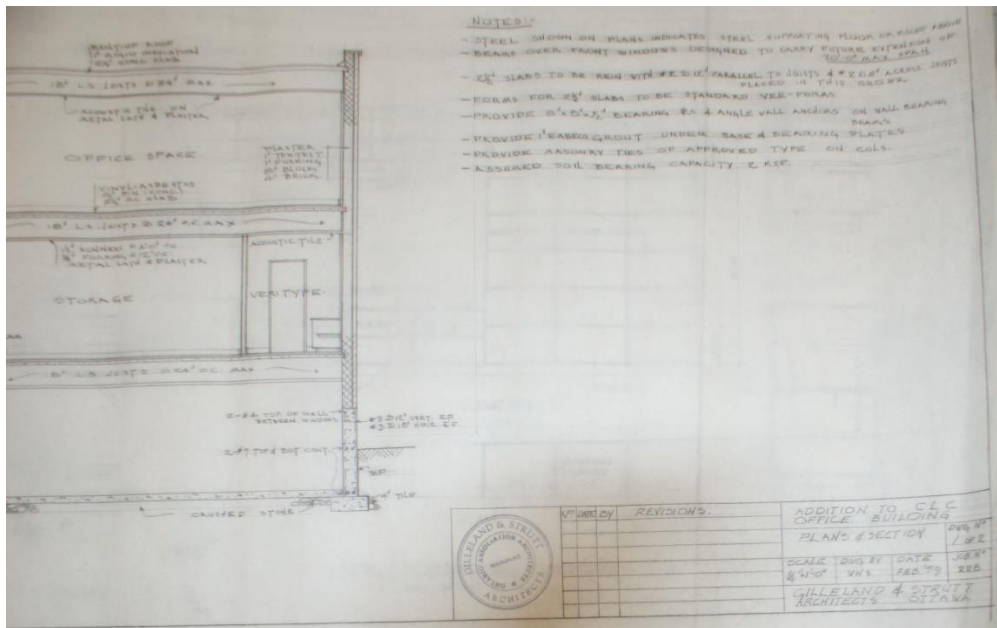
Partial plan and section of the 1959 addition. Note the steel columns embedded in the concrete block walls. Additionally, note the wide flange beams sizes supporting masonry walls above fenestrations as well as other locations. Source: LAC Lithwick Collection.
